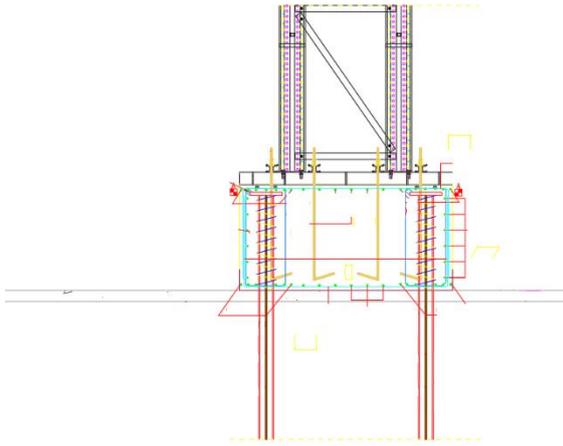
Constructive detail, solid foundation of the containment towers of the wall, supported by micropiles, adapted from [1]
